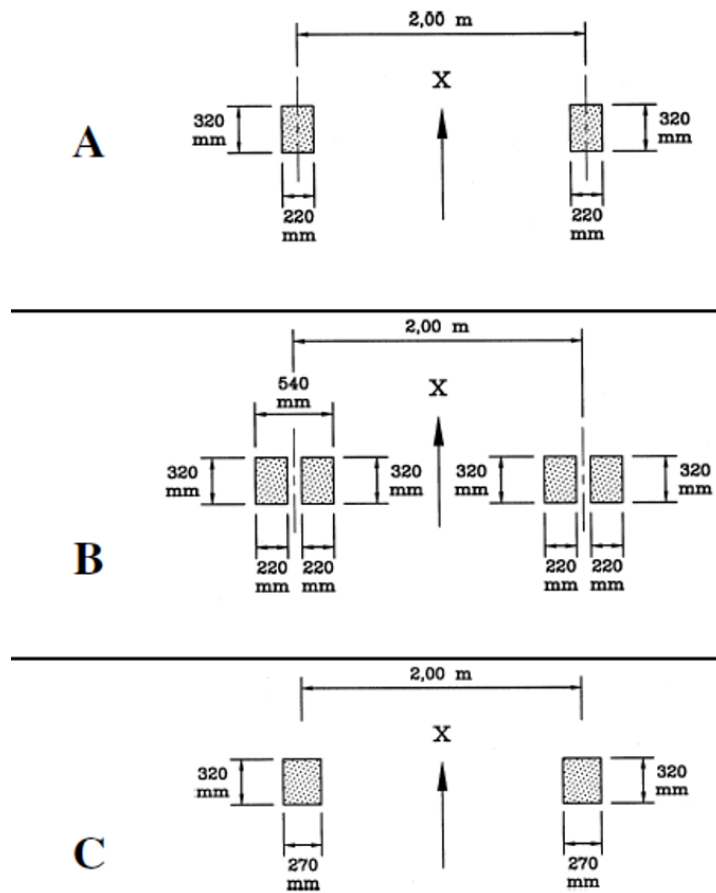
Definition of the geometric dimensions of the wheels and axles for FLM4.
